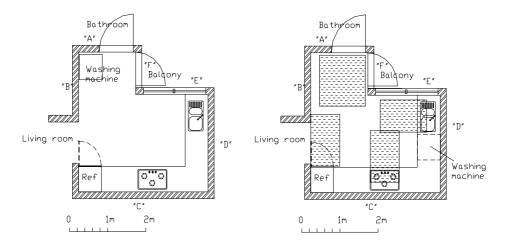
Washing machine cannot be placed near the bathroom door (Kitchen 9293-01).
